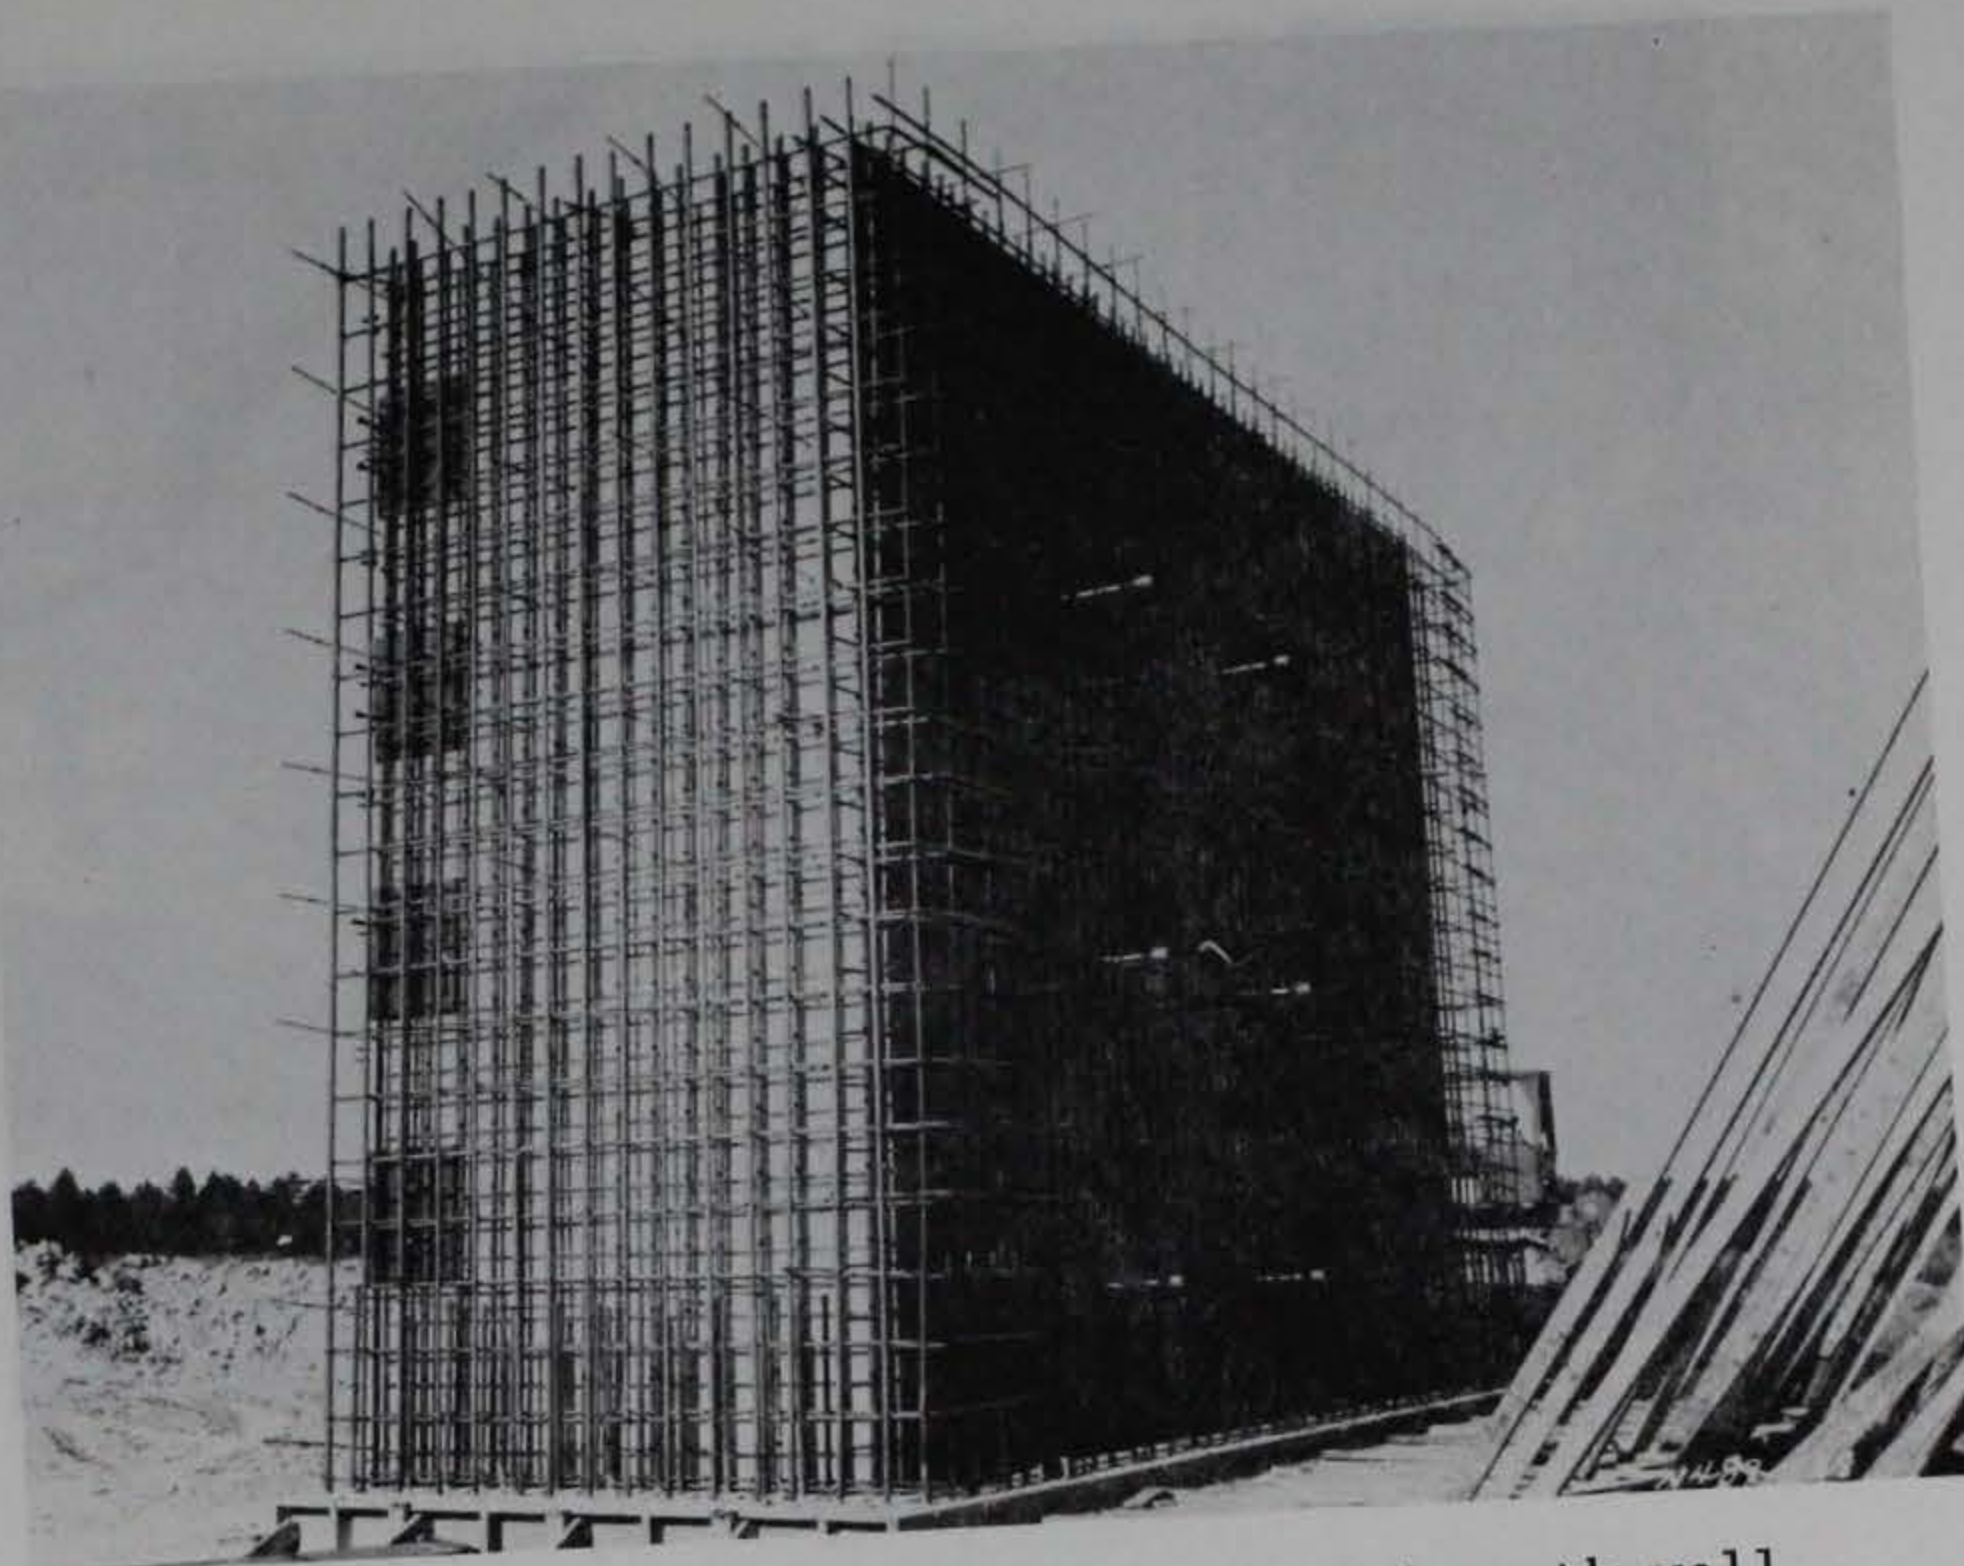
Acceptor bay west and south wall reinforcing steel.
